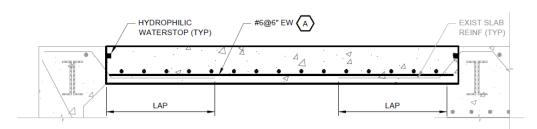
Working exist rebar into replaced concrete once interior work is complete
